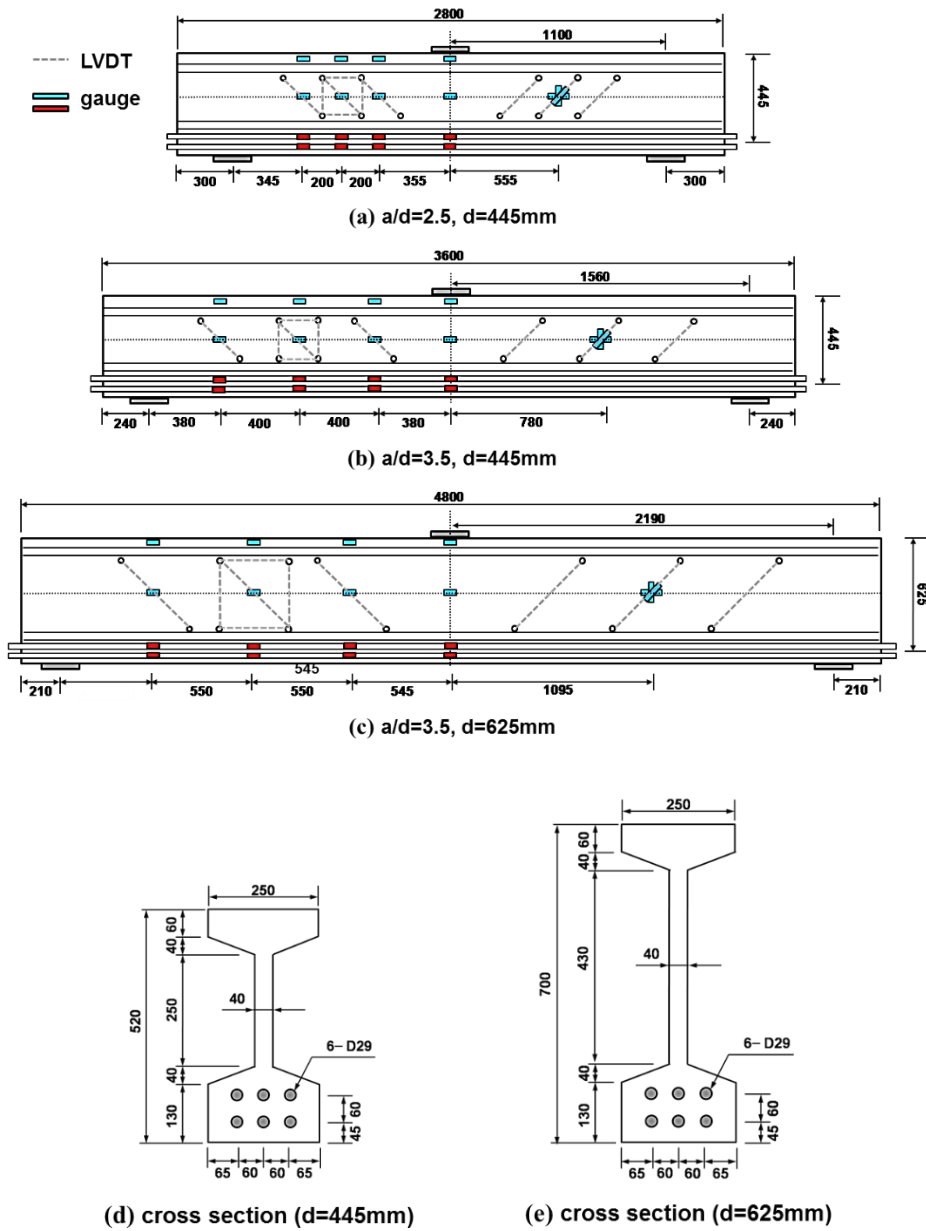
Loading configuration, Measurement plan and Specimen dimension
